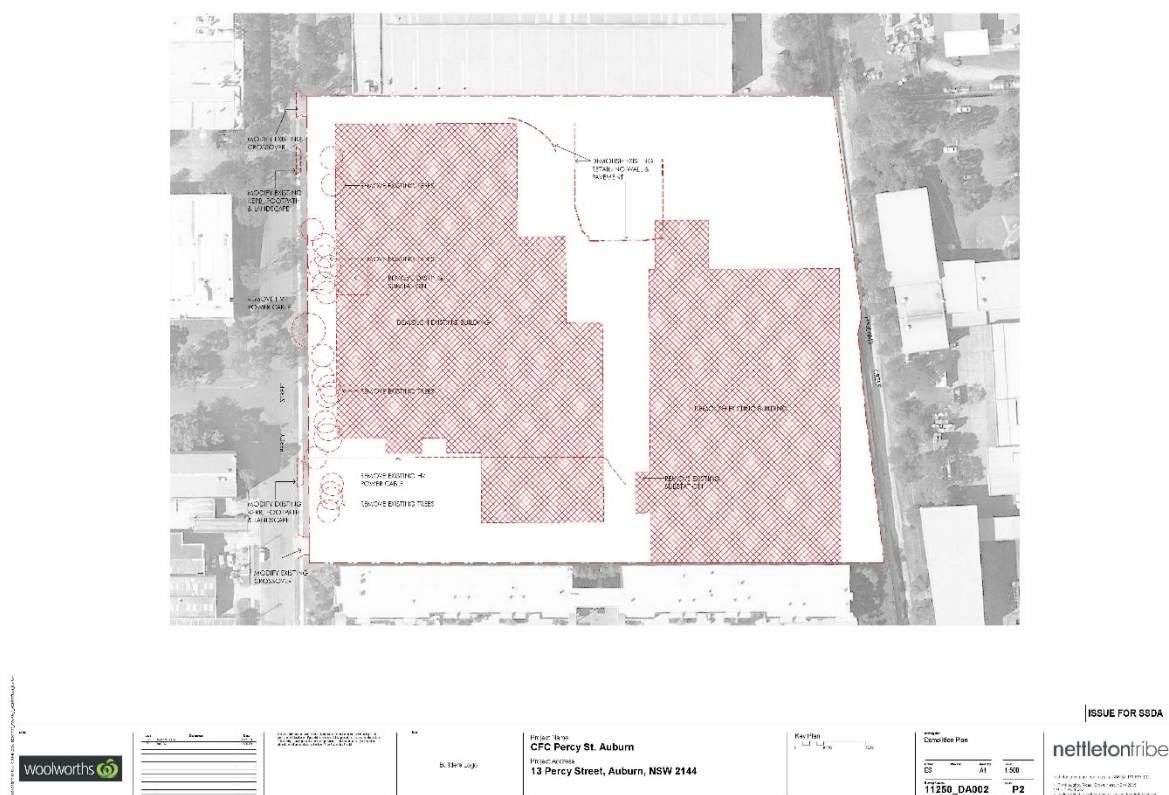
Proposed development site with overlay of existing electrical infrastructure
